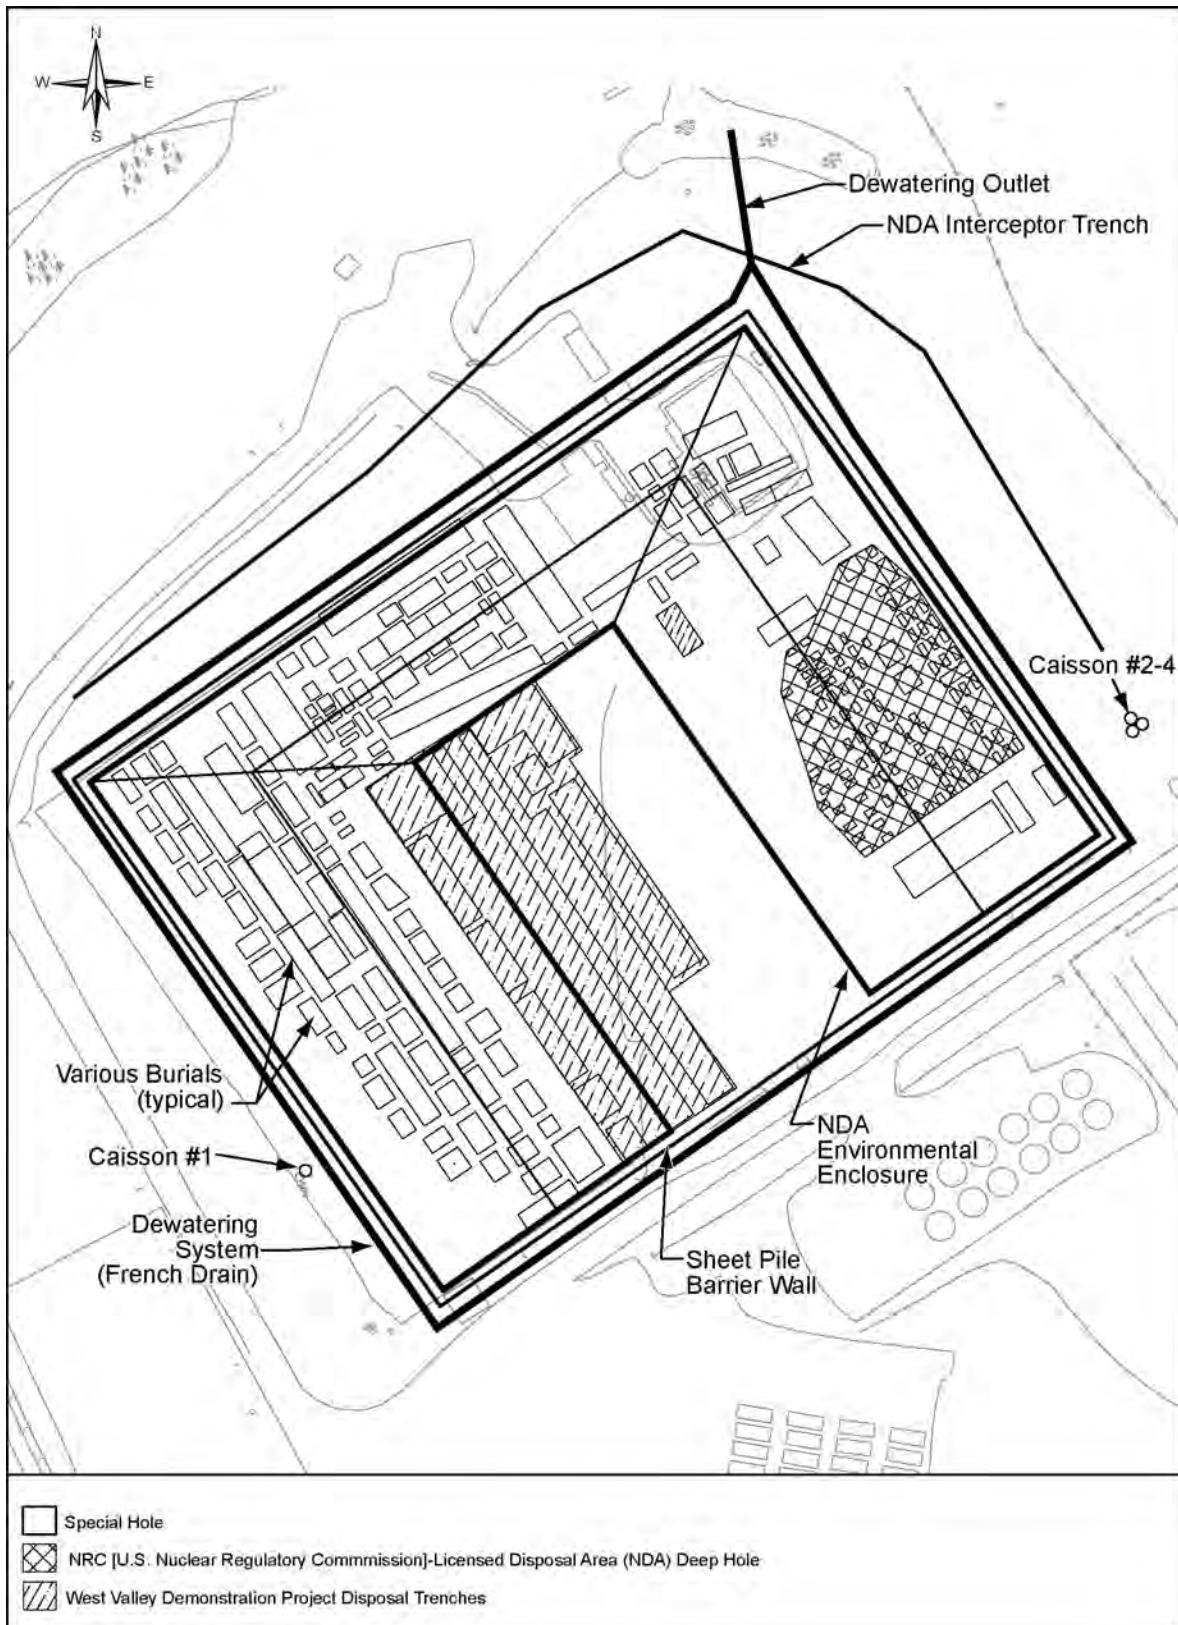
Conceptual NRC-Licensed Disposal Area Barrier Wall and French Drain Layout
